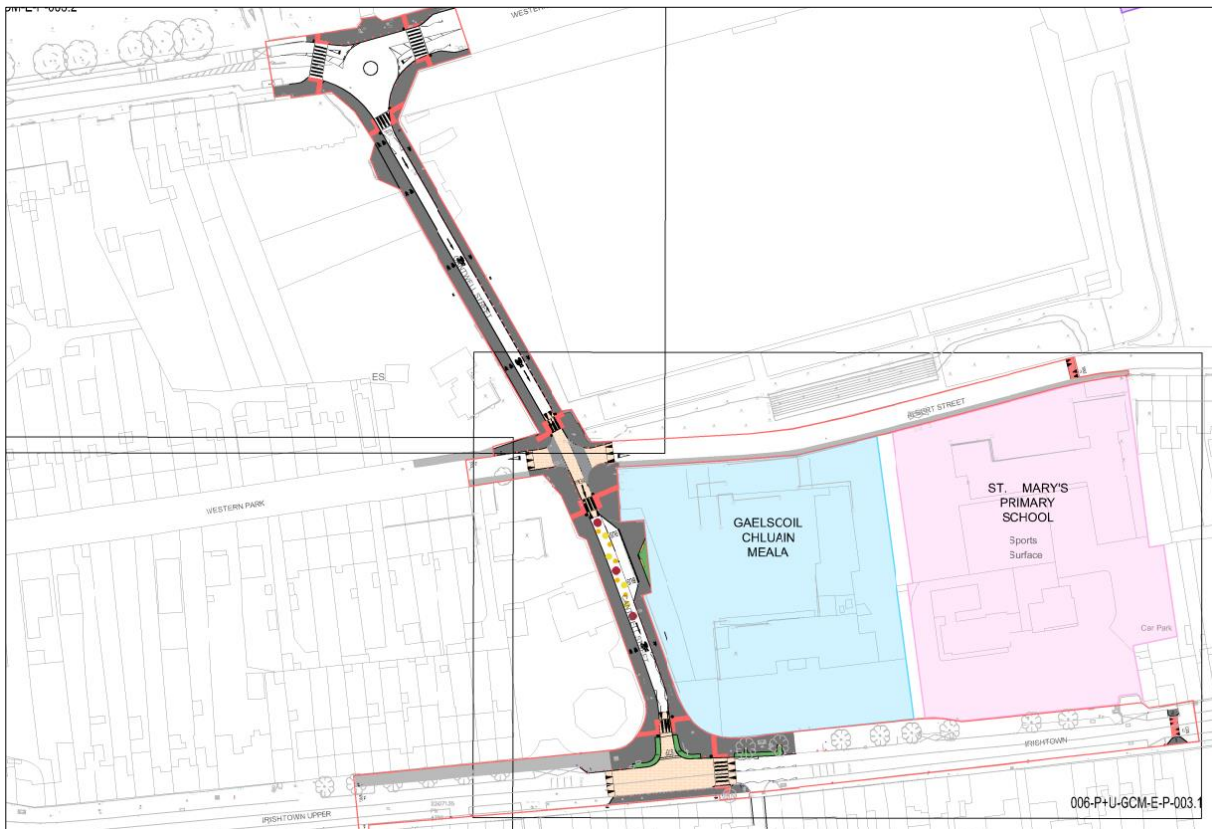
Cantwell Street Proposed Safe Route to School Design
